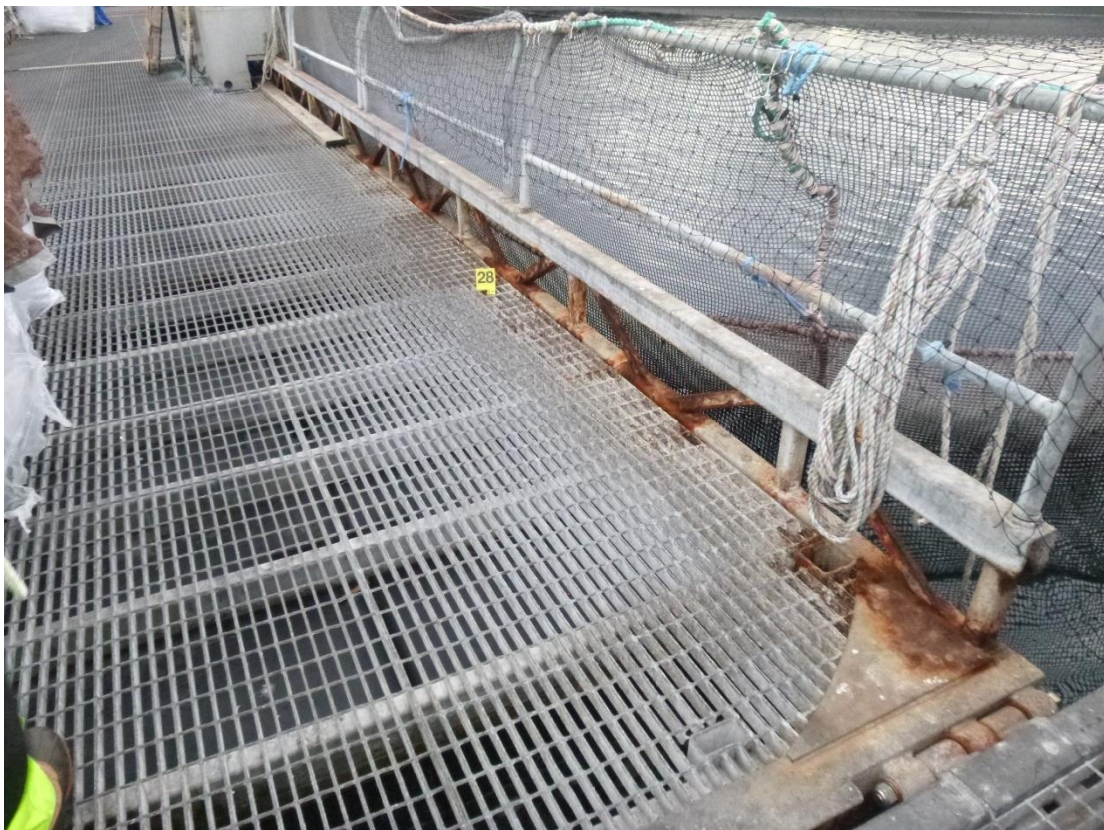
Typical 10ft Wide Dock Section with Light to Moderate Corrosion on Truss Members
